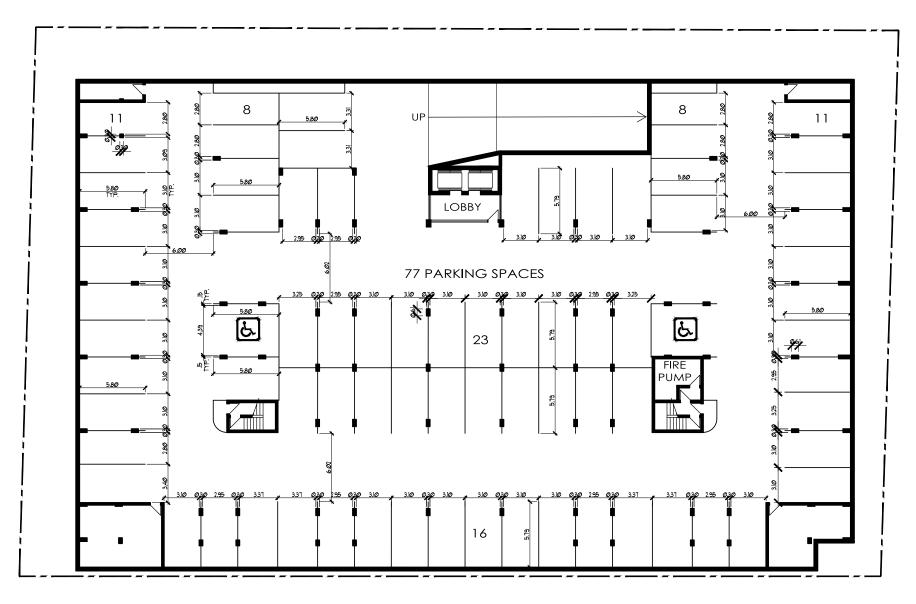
Underground Parking Plan prepared by Lintack Architects Inc.
